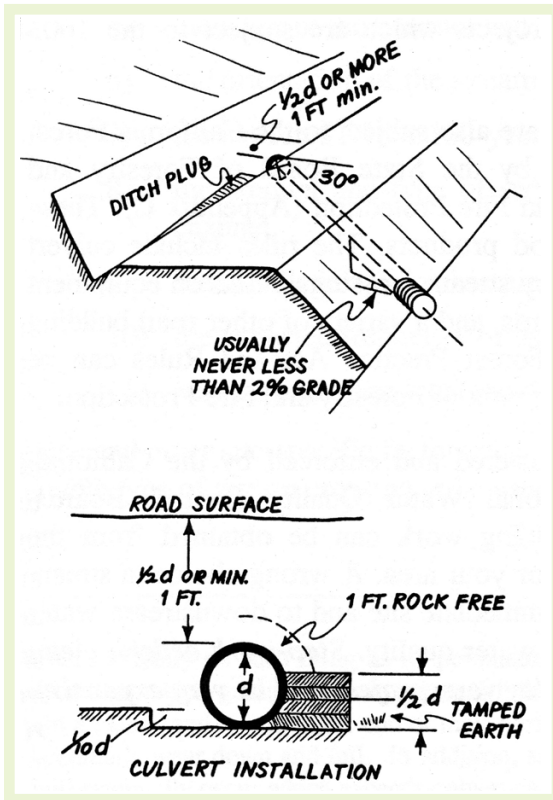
The elements of a properly installed ditch relief culvert. The culvert is angled at about 30° to the road alignment to help capture flow and prevent culvert plugging or erosion of the inlet area. It is set at the base of the fill (ideally) or with a grade slightly steeper than the grade of the contributing ditch (but never with a grade less than 2 percent). At a minimum, the grade of the ditch relief culvert should be sufficient to prevent sediment accumulation at the inlet or deposition within the culvert itself (it should be self-cleaning) (USDA-SCS, 1983).
